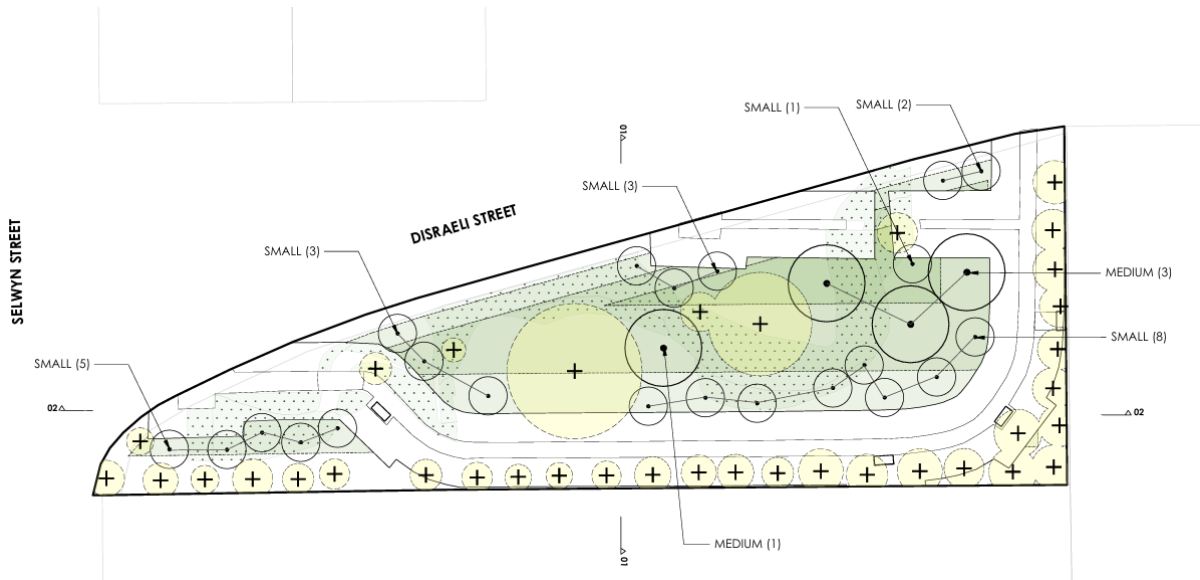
Proposed Disraeli Reserve Tree Planting Plan
